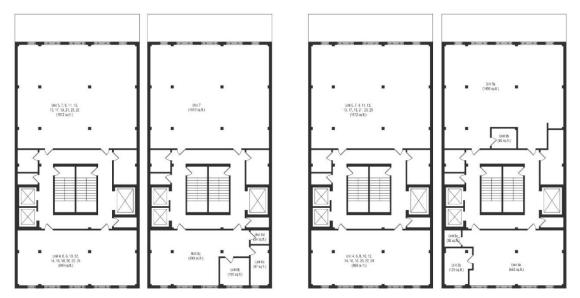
, 557, 558, 559 (left to right): Building 18, third floor (1910); same floor (1981); fourth floor (1910); same floor (1981) 1'' = 32'. North is up.
